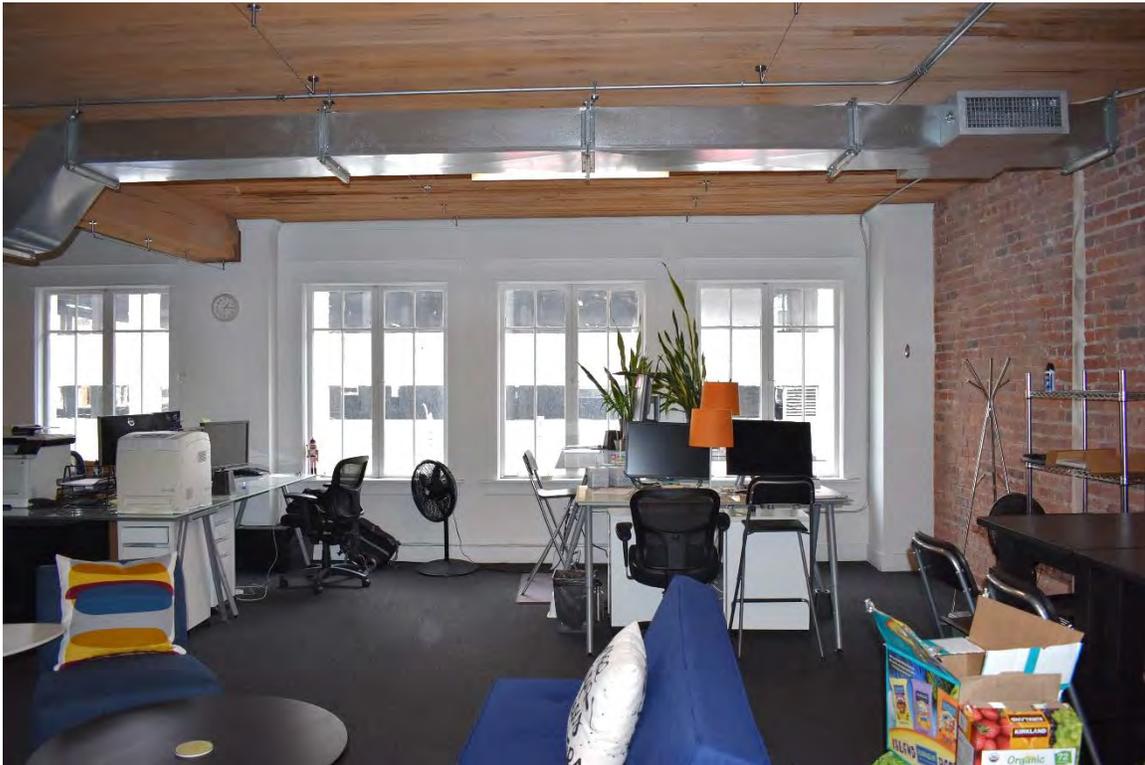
Interior, second floor office, storage and corridor at rear of floor
